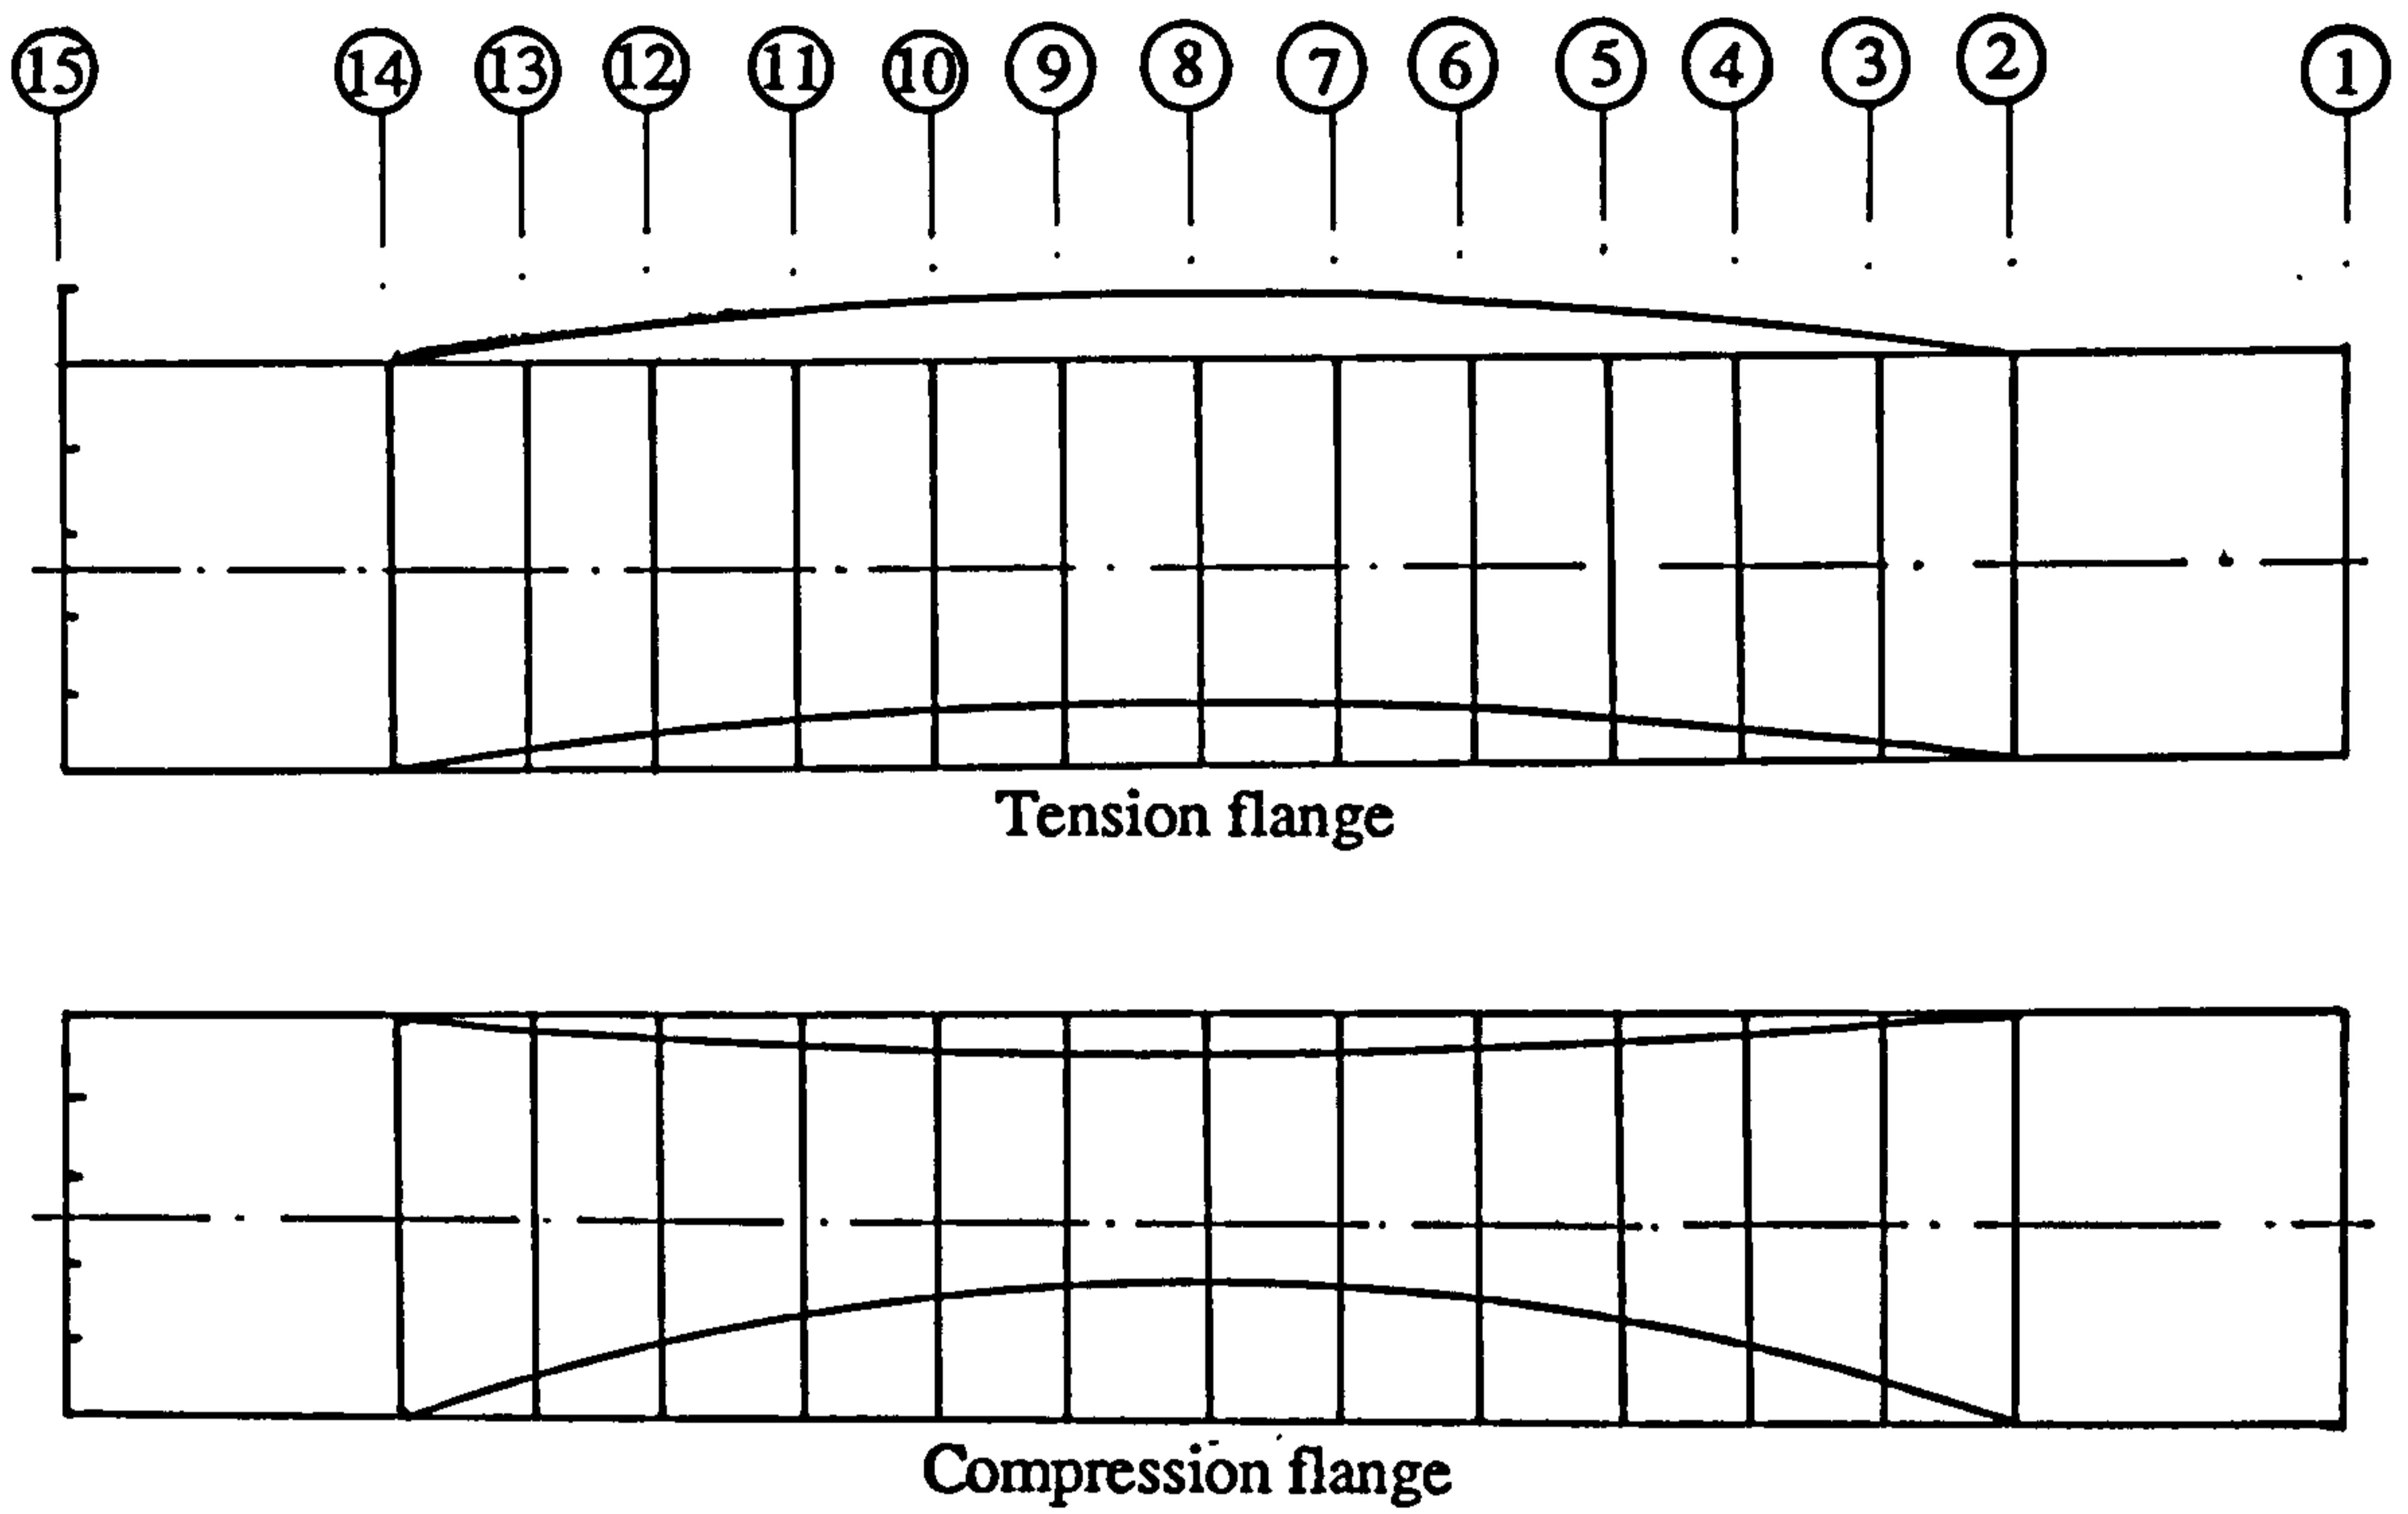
Initial lateral imperfection of flanges for the Welding Institute test
